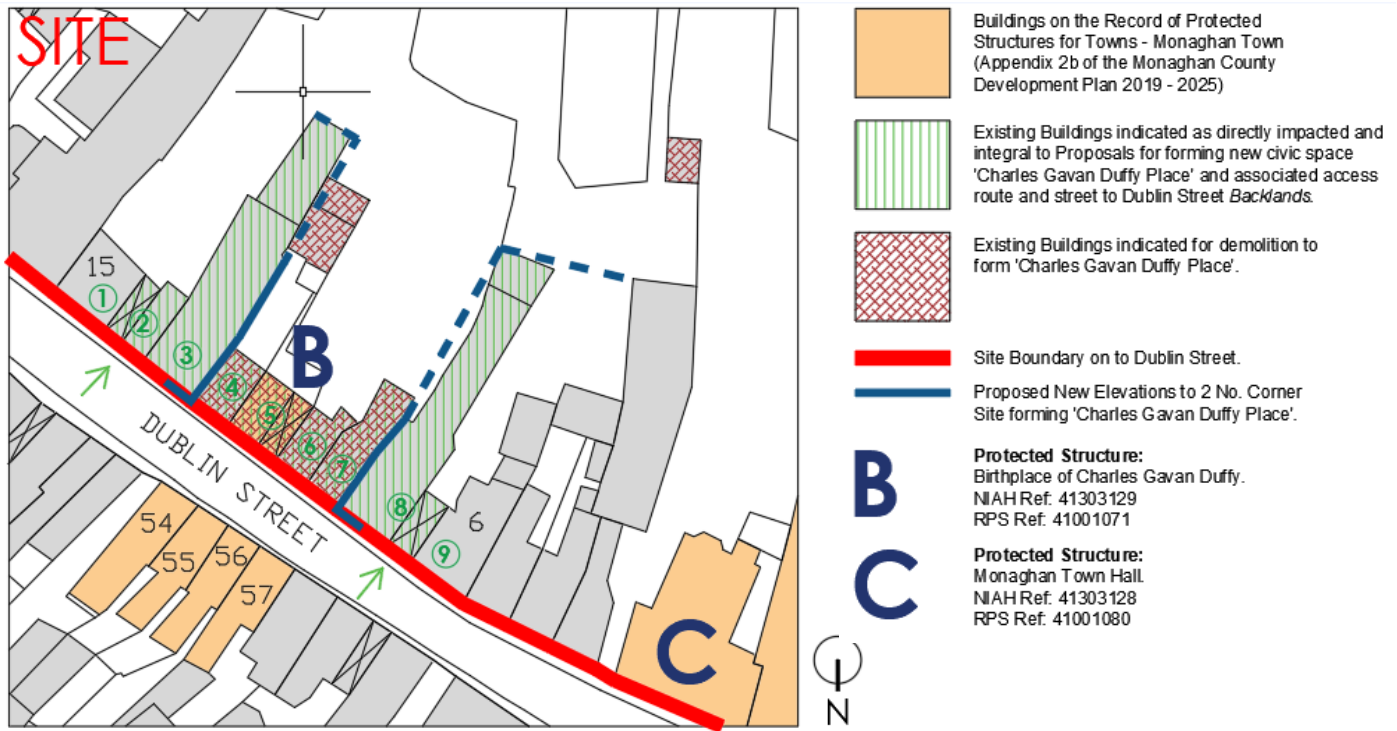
Existing Plan – Site Review (Consarc)
